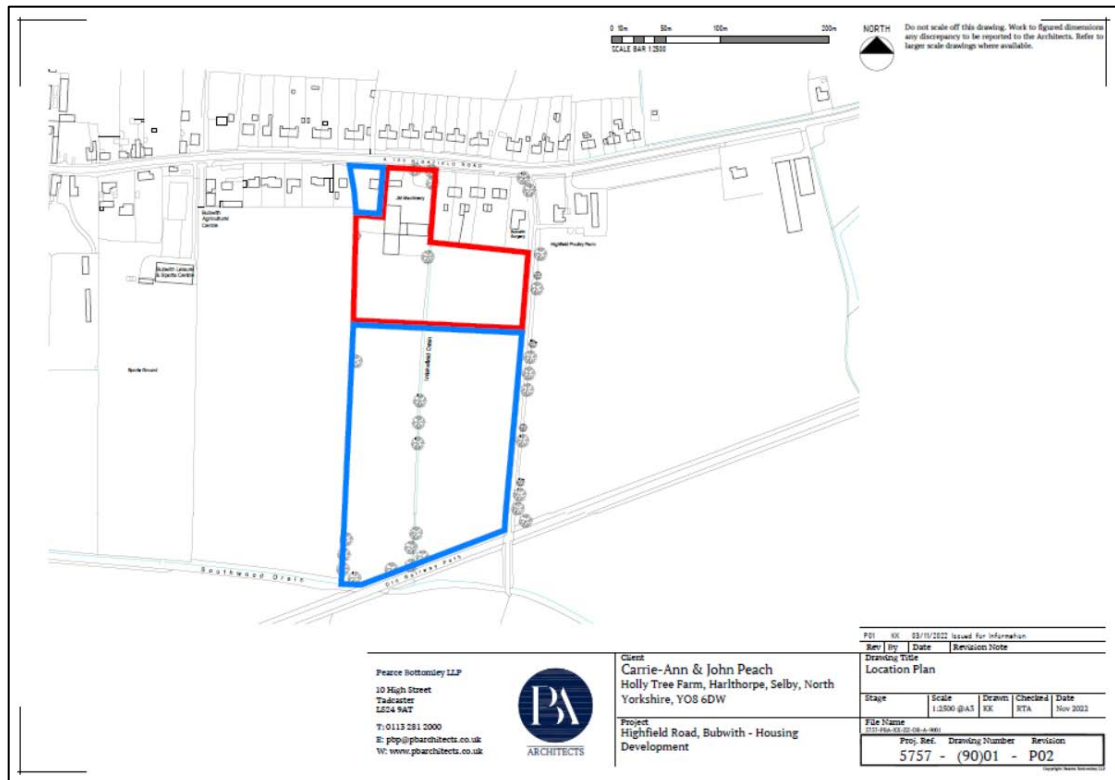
Site plan as existing with red line showing area subject to planning permission.
